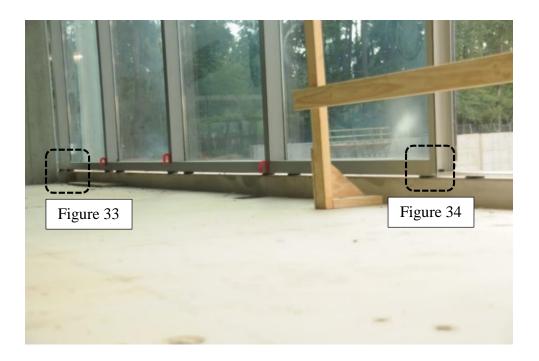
Curtain wall panels mounted over sill rail. Image: Andres Martinez.
